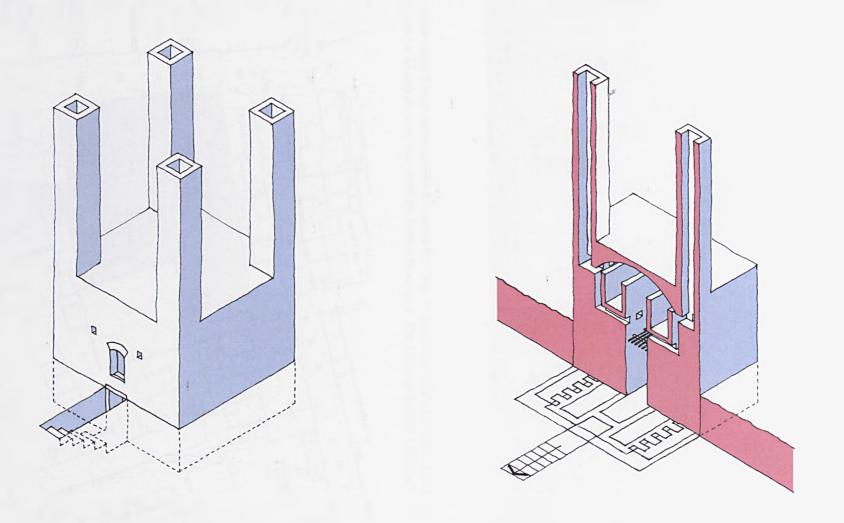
Reconstructed isometric views of a Sheffield cementation furnace (left) described by Broling, based on drawings of a similar example he had seen at London (right, reconstructed isometric section) but with four corner chimneys instead of two (author).
